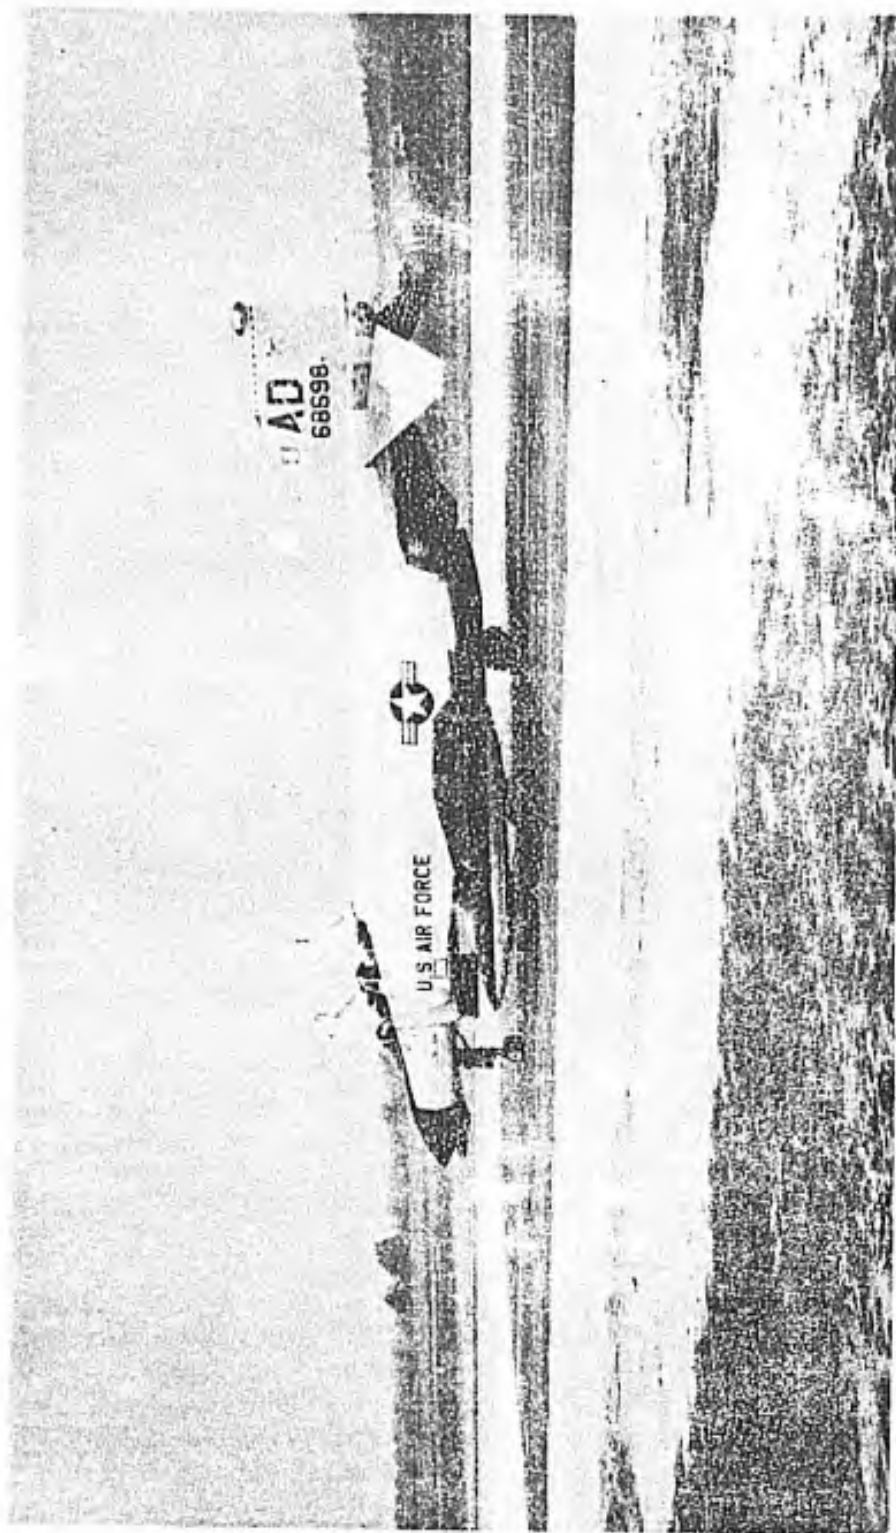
F-4 Aircraft Traffic on the AC Test Item.
